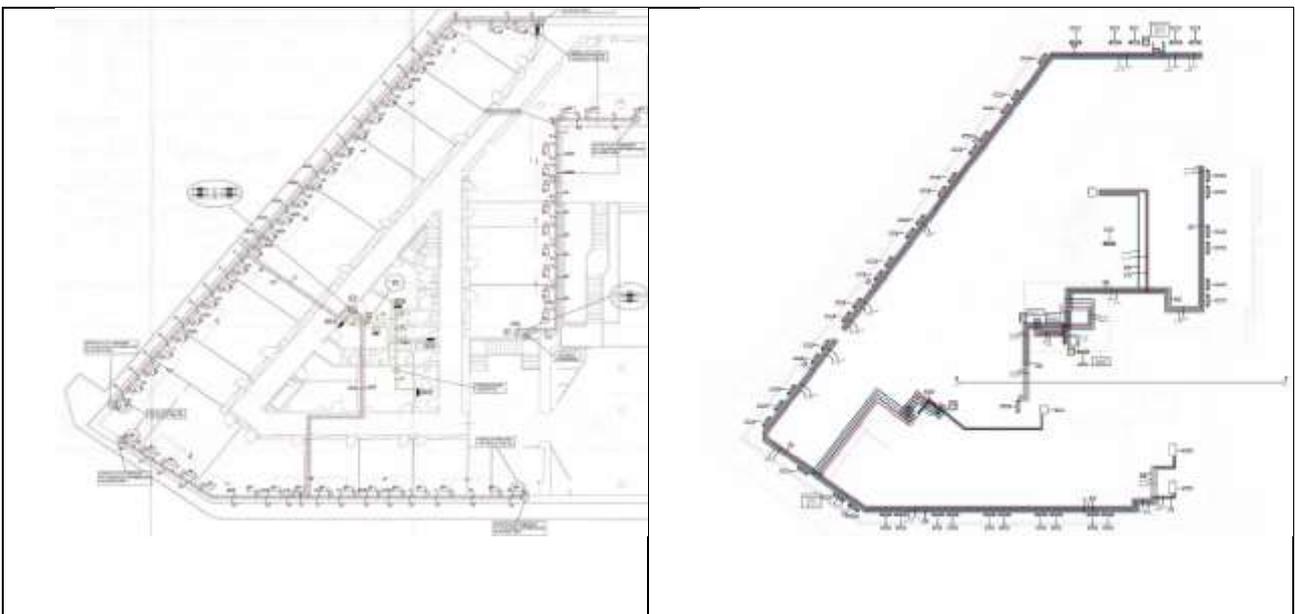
Modelling the Fan Coil Piping of the Project AutoCAD and REVIT format Source.
